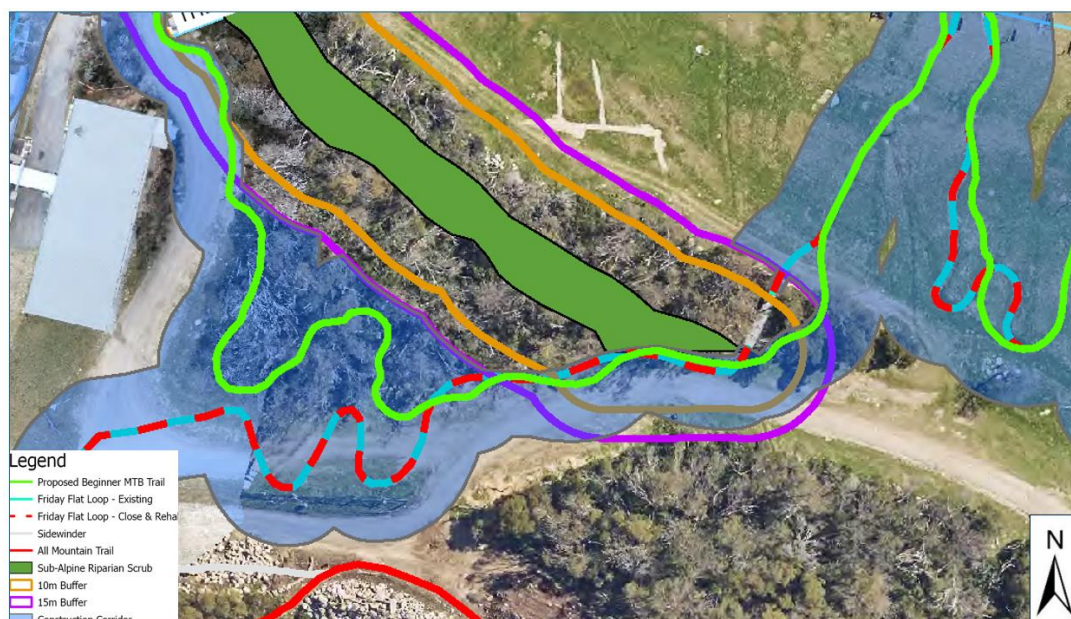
| Site plan identifying the location of proposed works in proximity to the existing Friday Flat Loop (Source: Applicant's SEE 2024)
